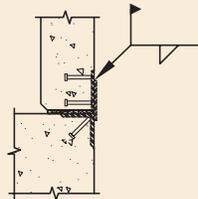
Bearing wall to foundation (BWF2).
